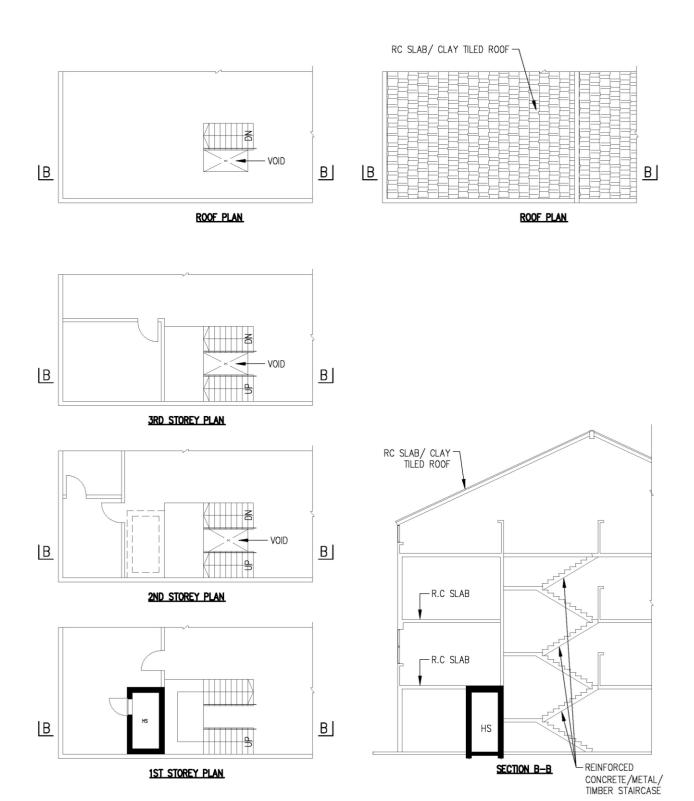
(i) RC/CLAY TILED ROOF COVER OVER STAIRCASE NEAR HS WALL IN A LANDED DEVELOPMENT
